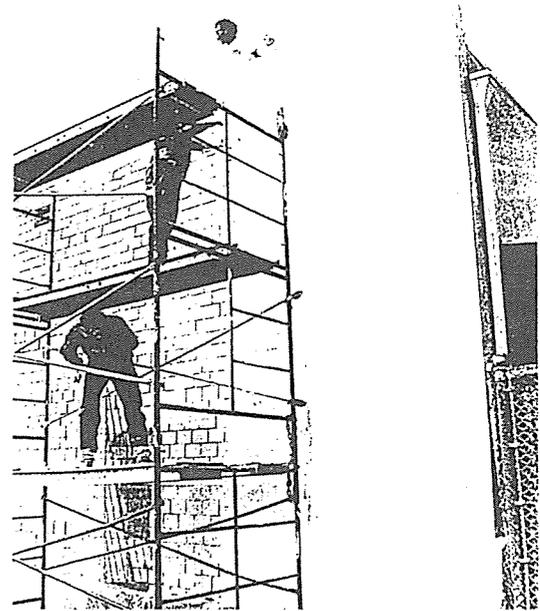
Application of Composite Fabric for Wall Strengthening[28]
